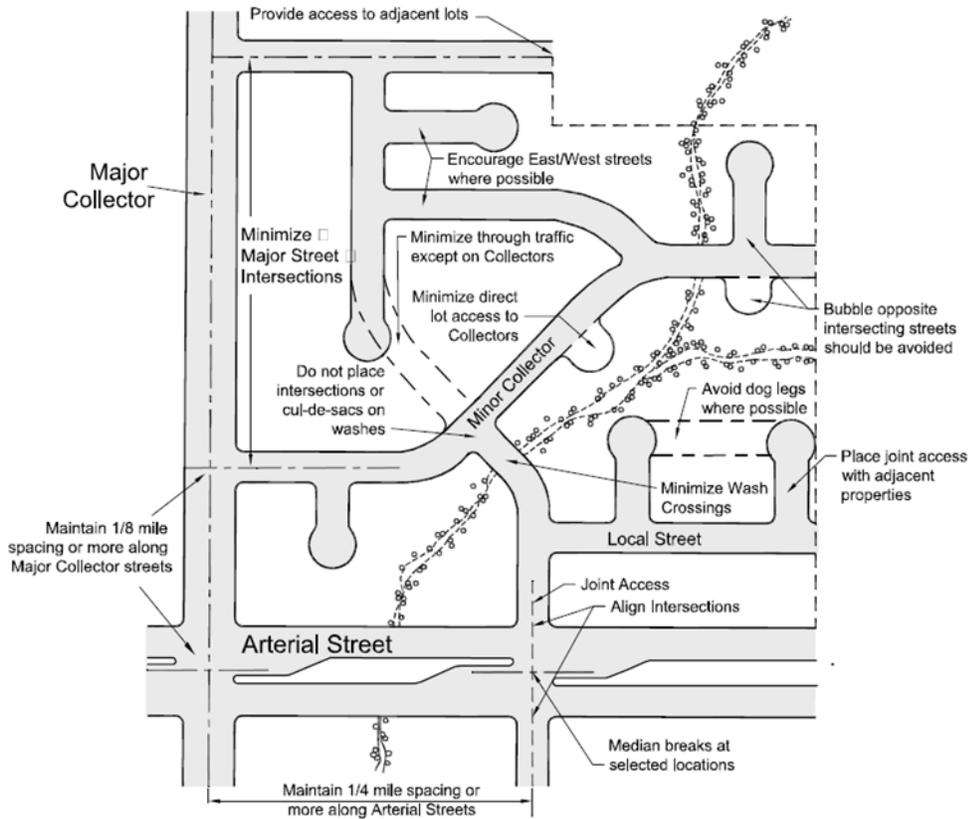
SUBDIVISION STREET PLANNING
